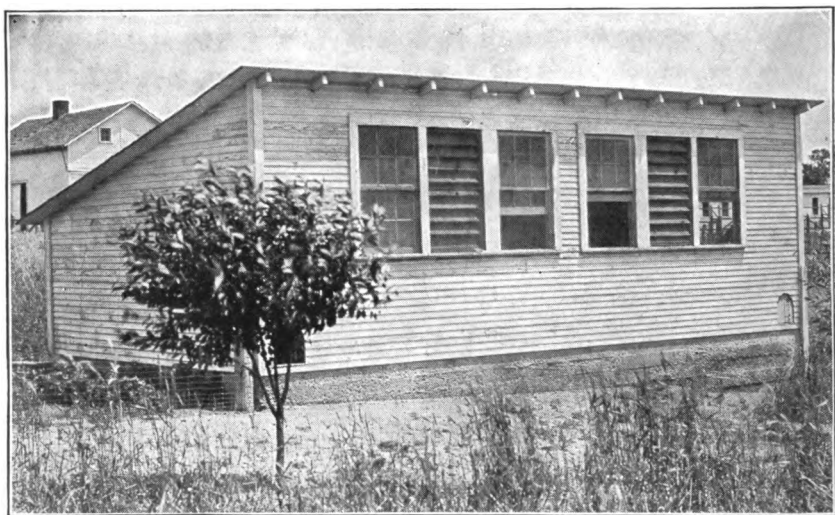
Shutters—a new type of ventilation that is proving successful.
